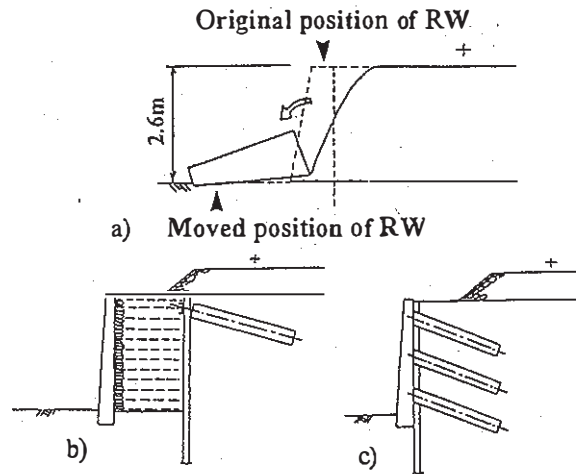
Cross-sections of a) a typical damaged leaning-type RW constructed in 1937 (LT1 in Fig. 4), and b) a GRS-RW and c) a nailed RW by reconstruction, the north side slope of the embankment between Setsu-motoyama and Sumiyoshi Stations, JR Kobe Line.
